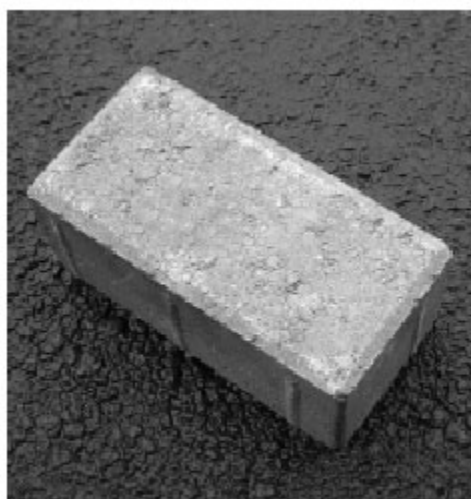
Spacer bars are small nibs on the sides of the pavers that provide a minimum joint spacing into which joint sand can enter.
